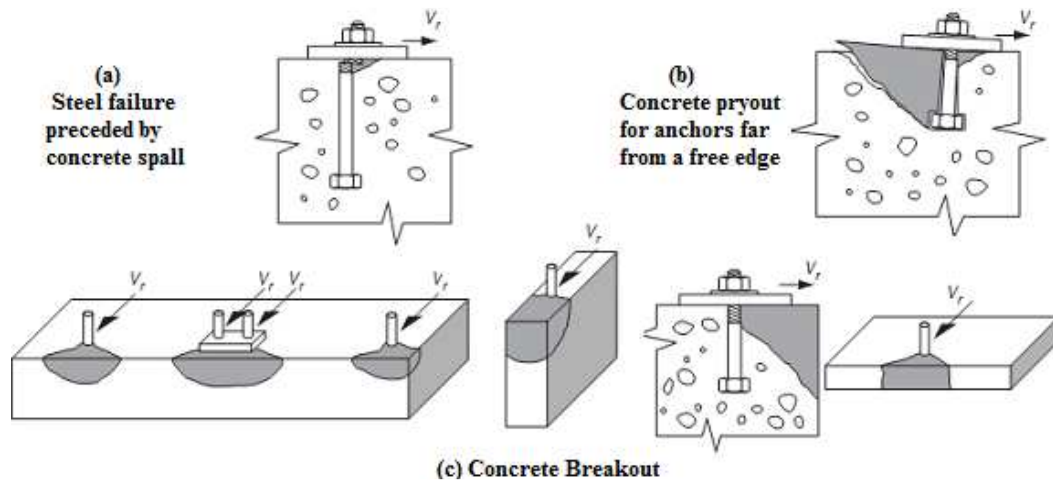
16 Failure modes of anchors under shear loading, after CSA A23.3, 2004.
